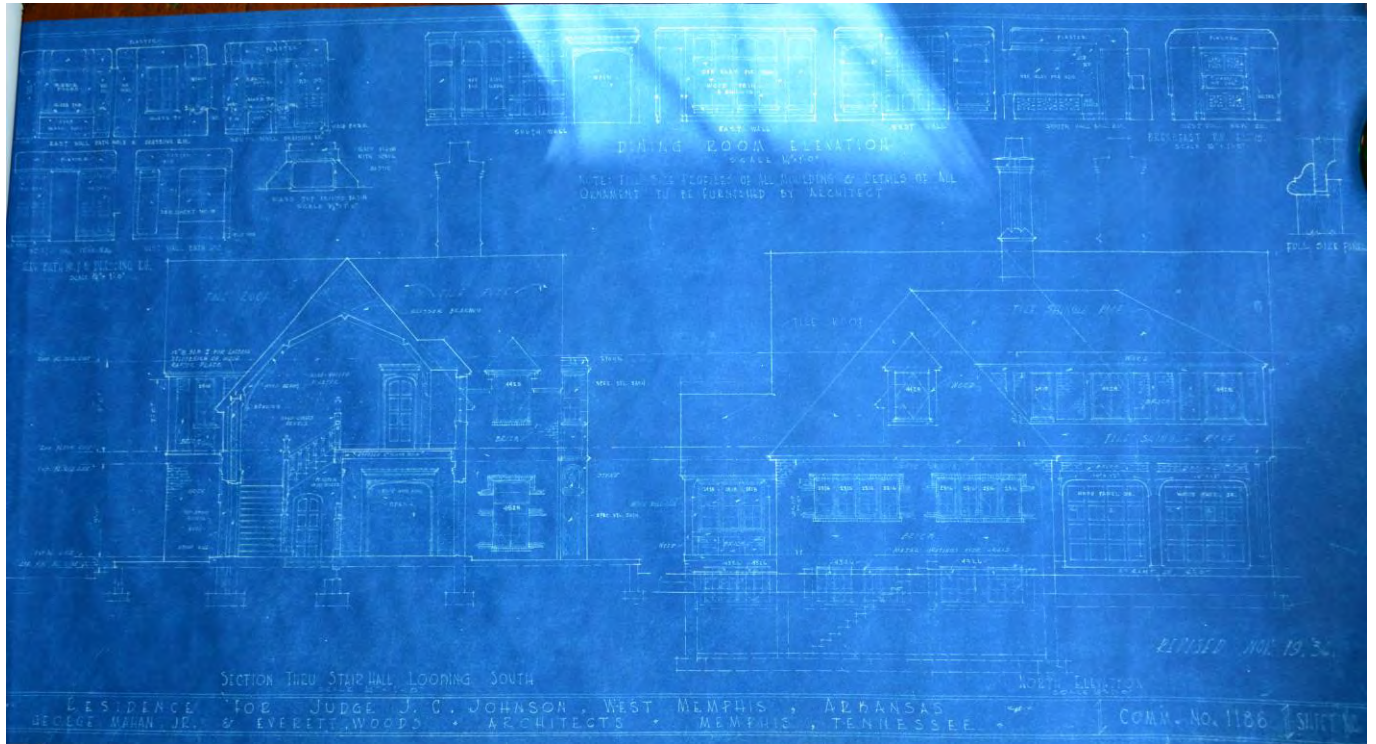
North Elevation and Section Drawing, Johnson-Portis House, 1936.
